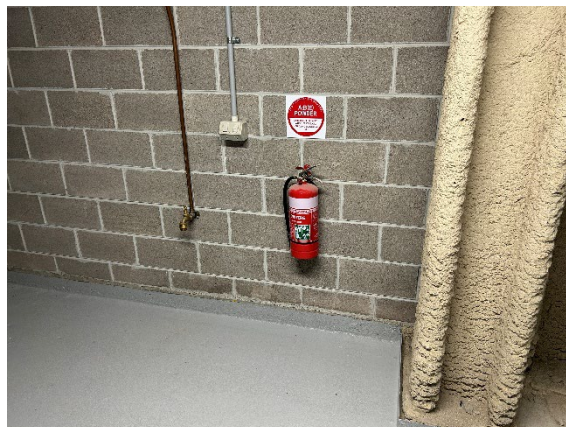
Ground Floor Retail Garbage Room ABE fire extinguisher.
